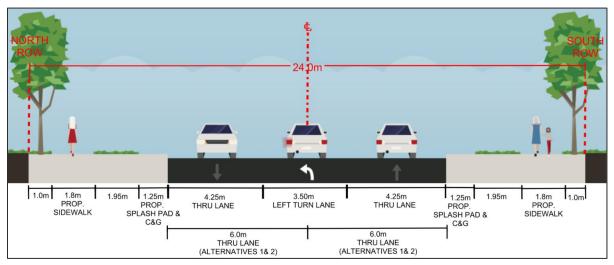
Alstep Drive Alternatives Typical Cross-Section ¹⁵
